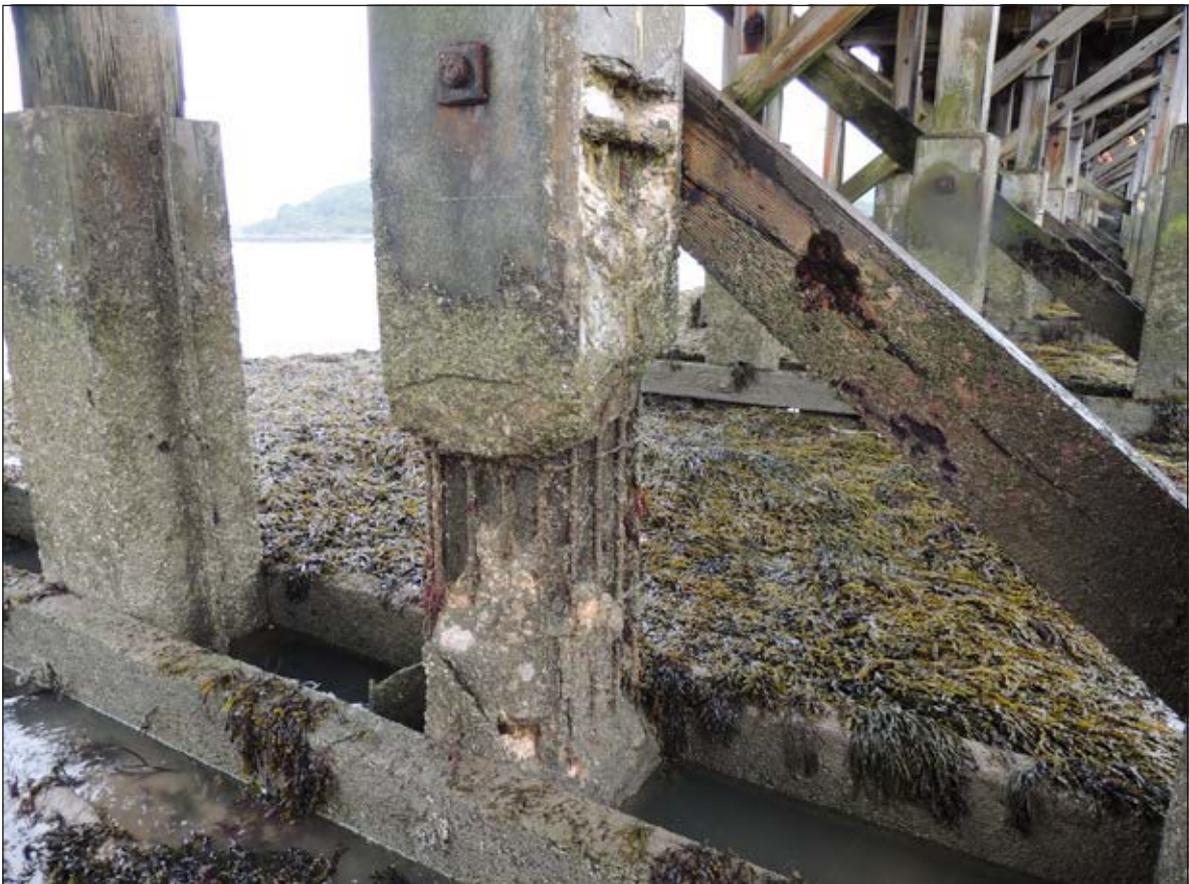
ESE facing shot of damaged reinforced concrete pile casing with exposed rebar of trestle 13.
